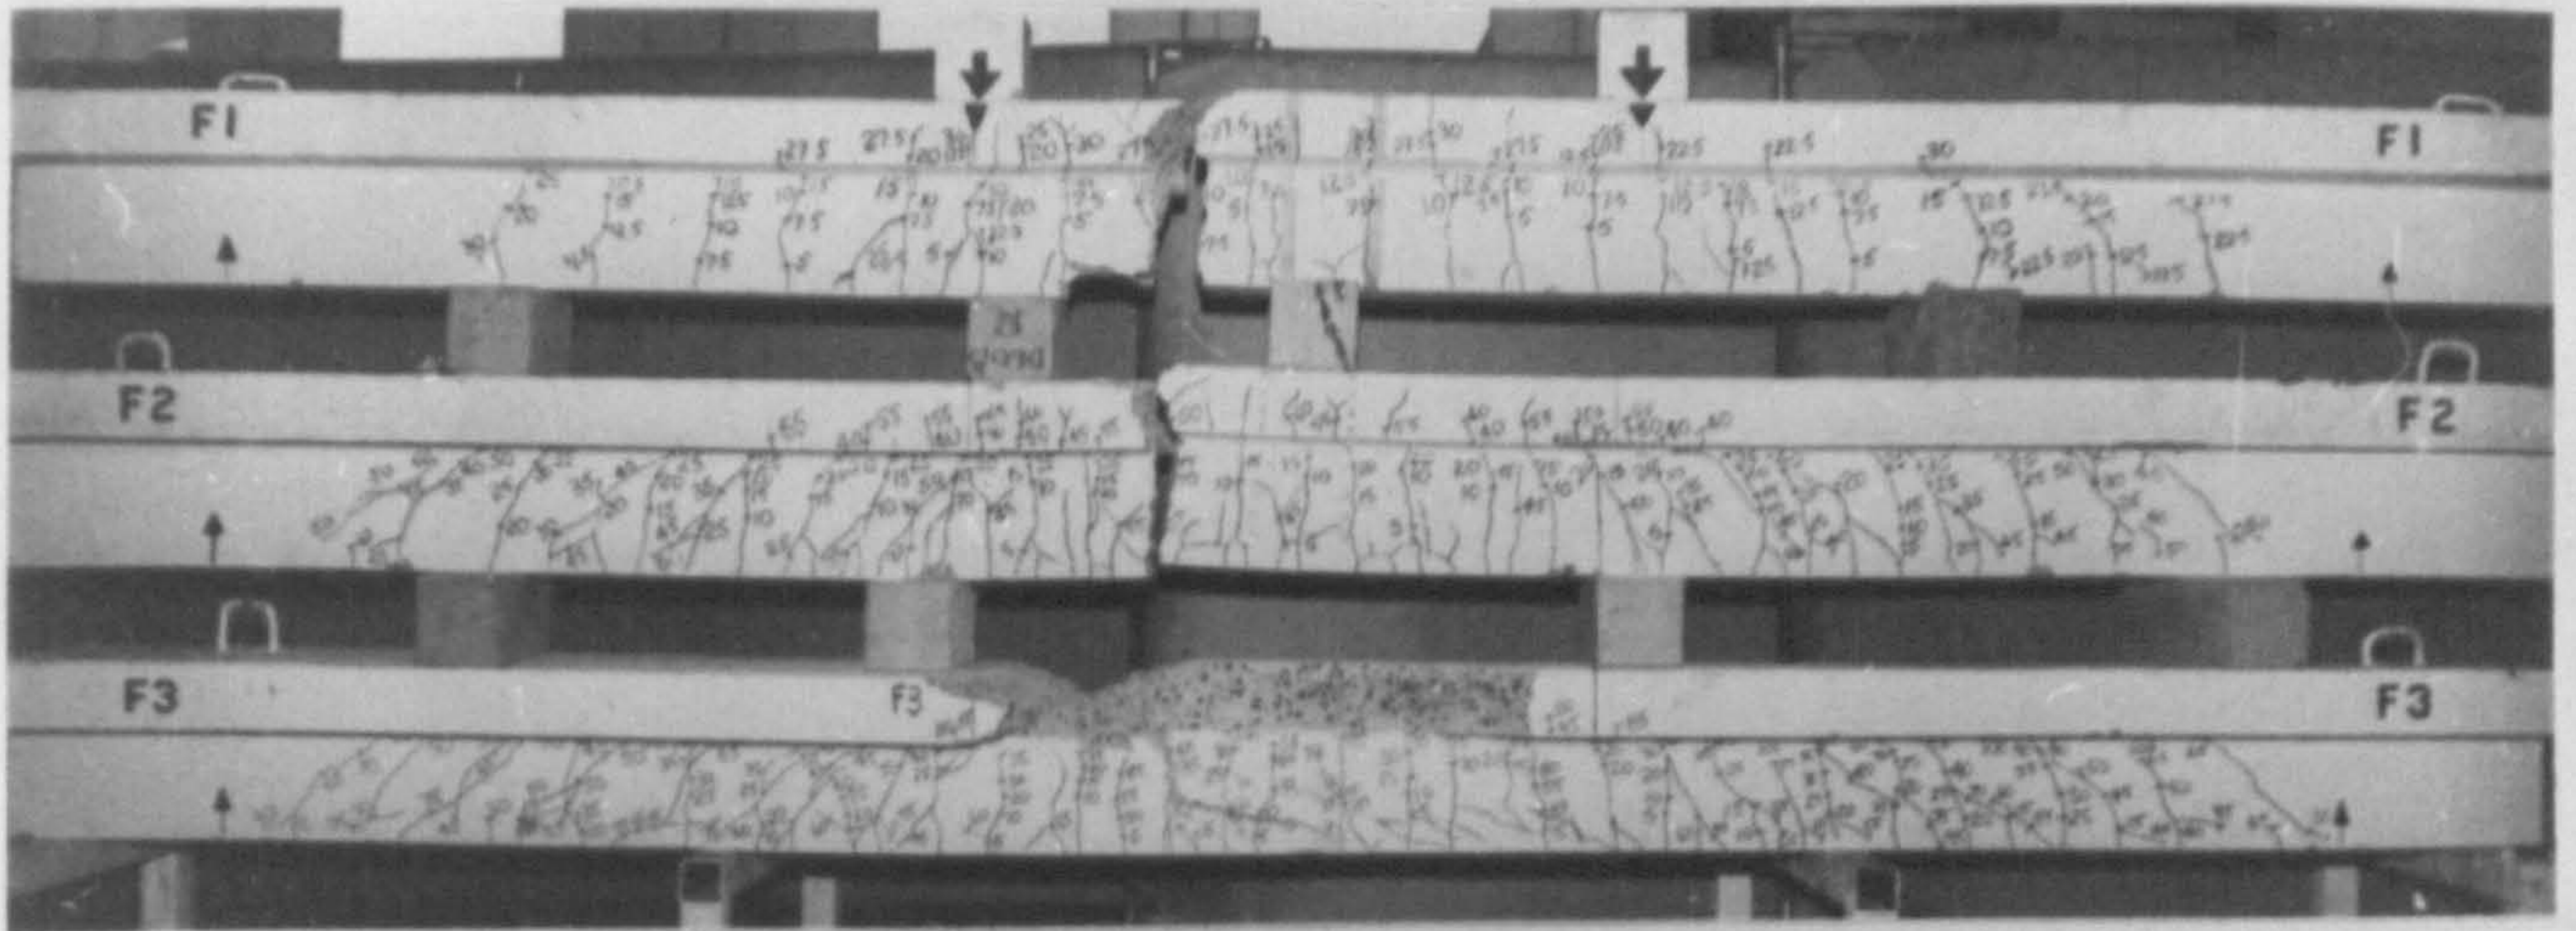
FAILURE MODES FOR LYTAG-SAND CONCRETE T-BEAMS IN FLEXURE
